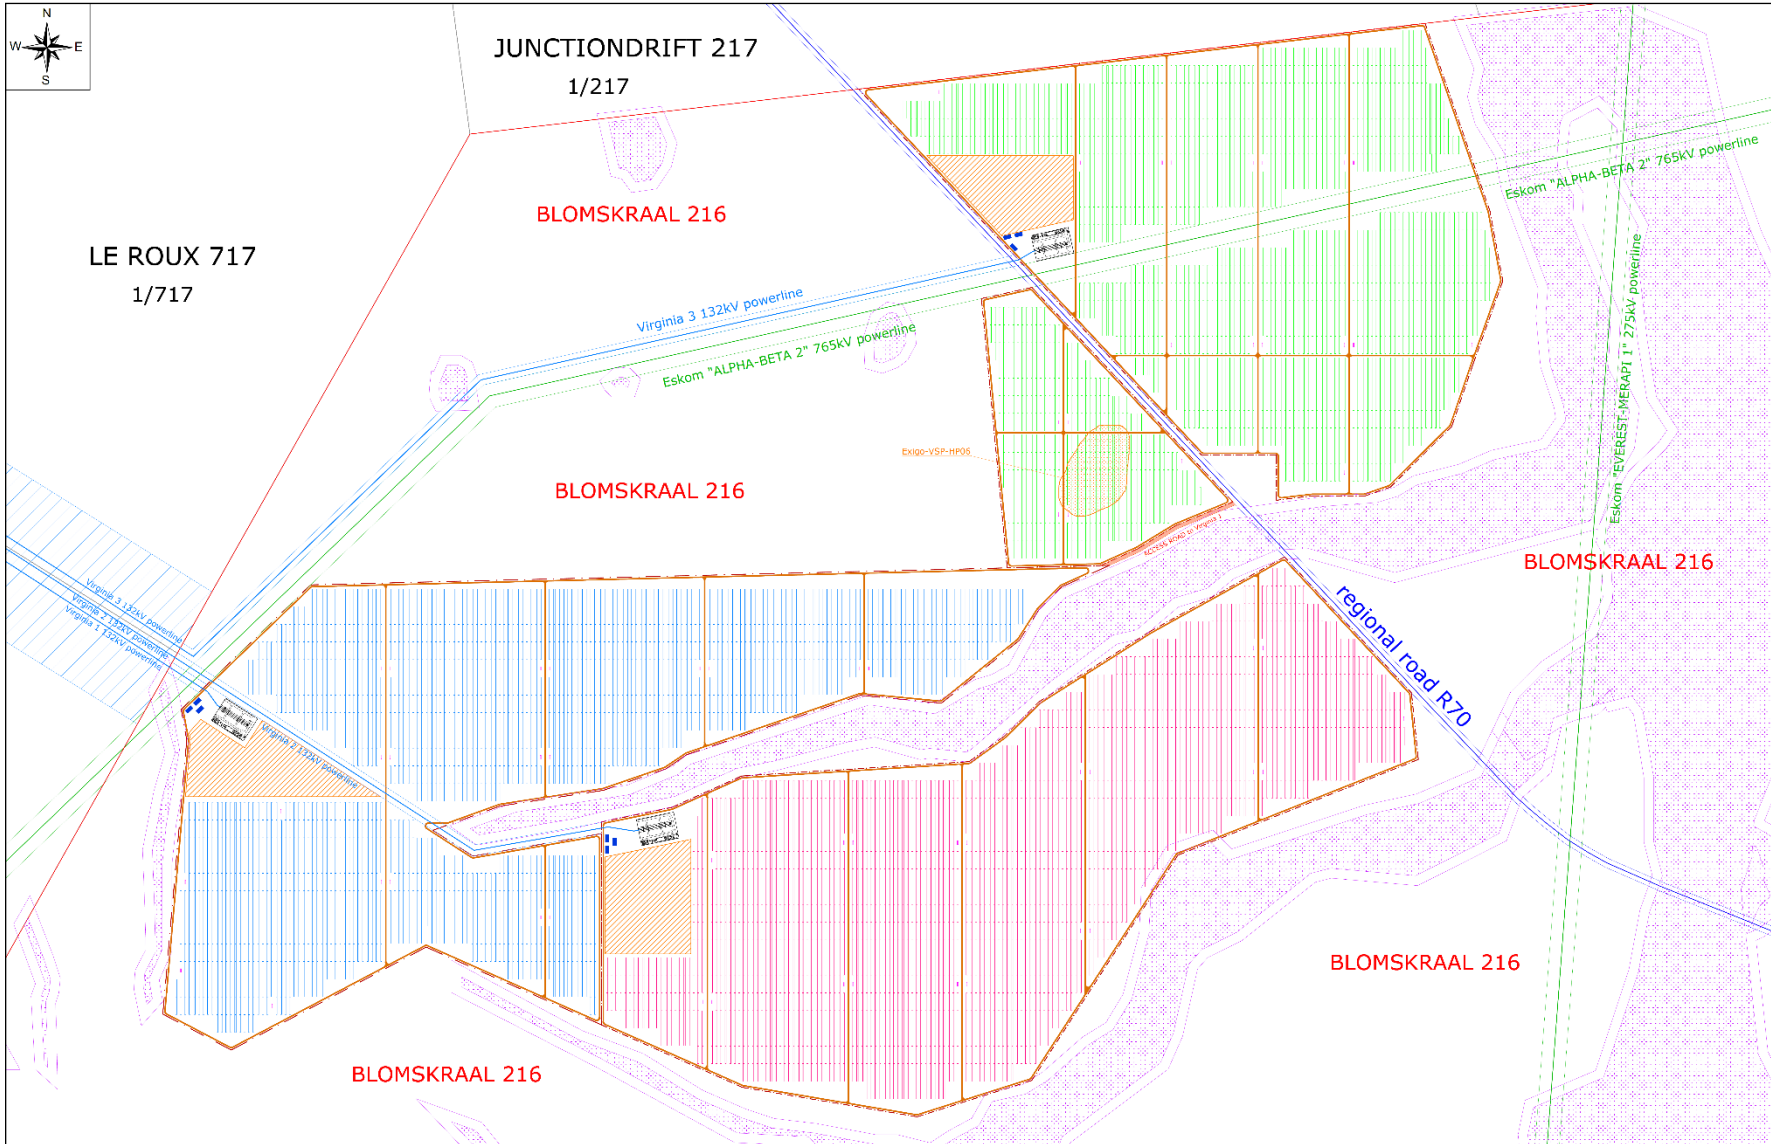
Proposed Layout Plan of the Virginia 2 Solar Park (Red polygon)
